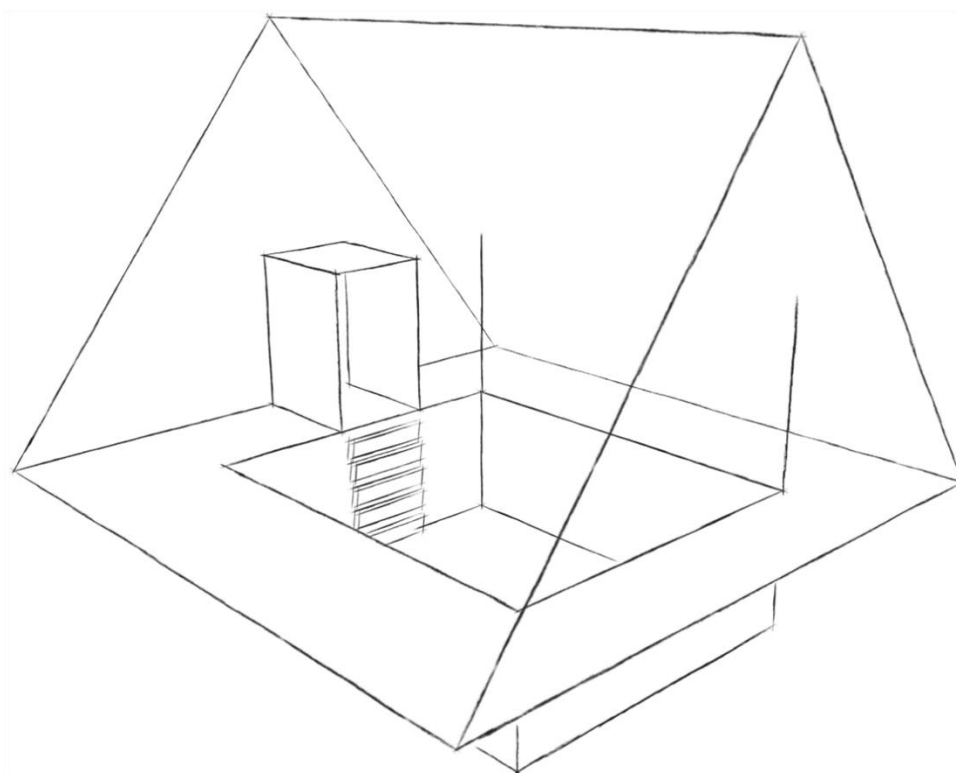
Sketch of a turf-covered *jarðhús*. The sunken-floor of the *jarðhús* would have been accessible via a ladder or wooden steps set into the wall. Author's own.
